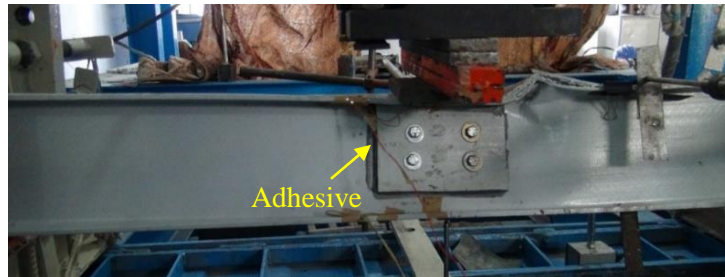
Local failure of the compression flange of beam stiffened with FRP web plate. (7C-WP-AS beam)
